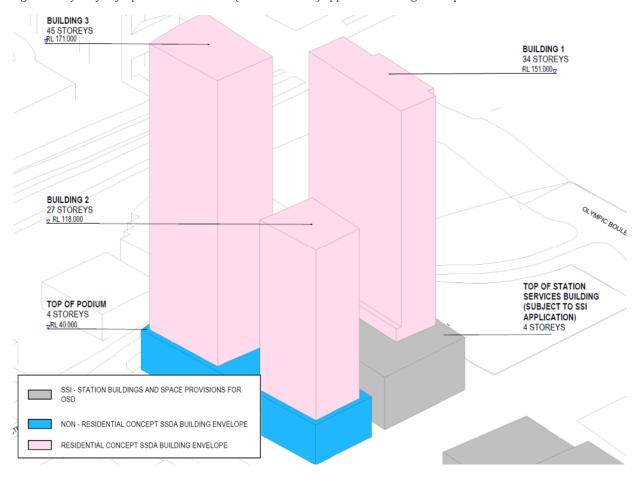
Sydney Olympic Park OSD Building 1 amended building envelope
